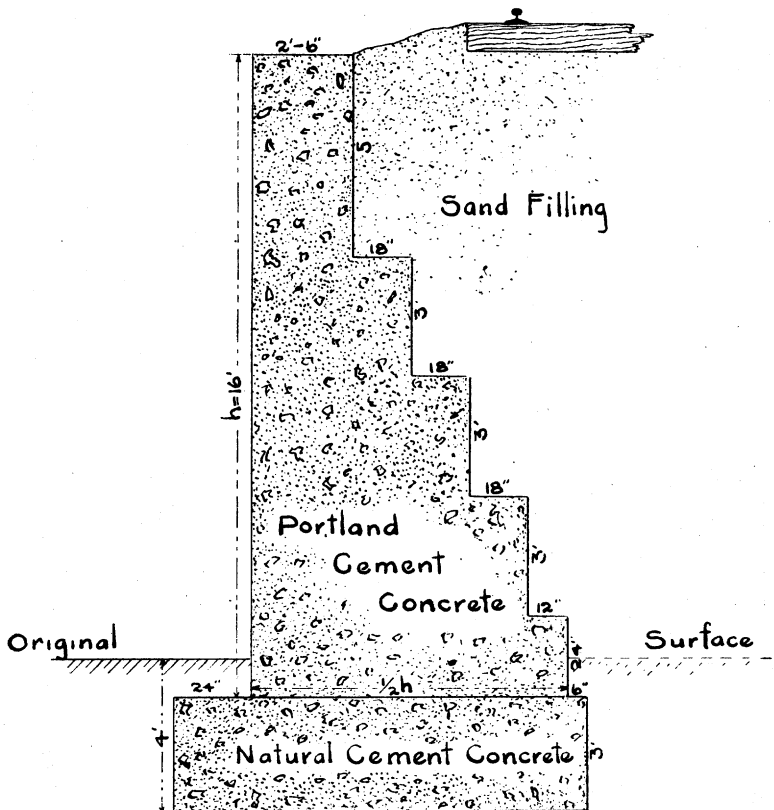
Section of Retaining Wall C. R. I. and P. R. R. Showing Maximum Section.
